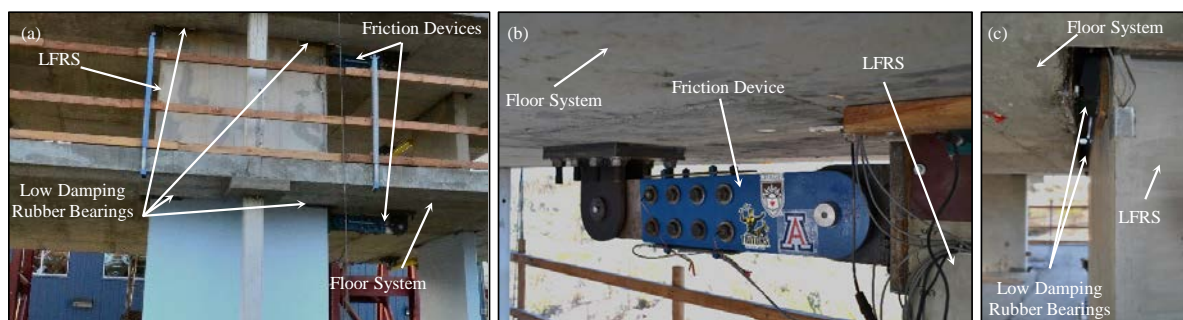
Implementation of the deformable connection on a rocking reinforced concrete shear wall structure at NEES@UCSD equipment site.
